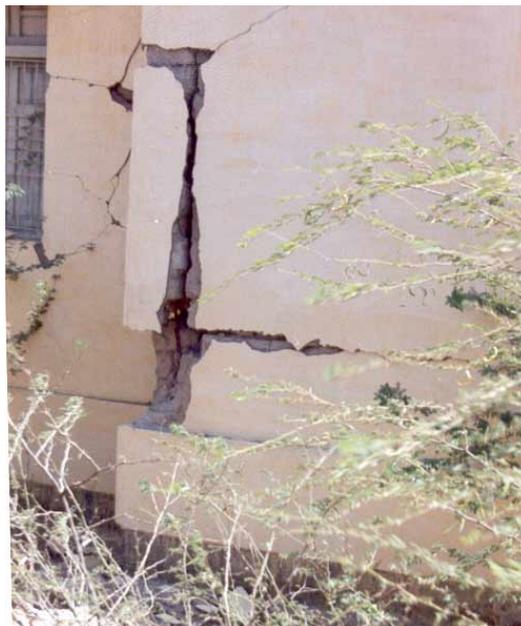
Corner failure in presence of corner reinforcement (Bhuj)
